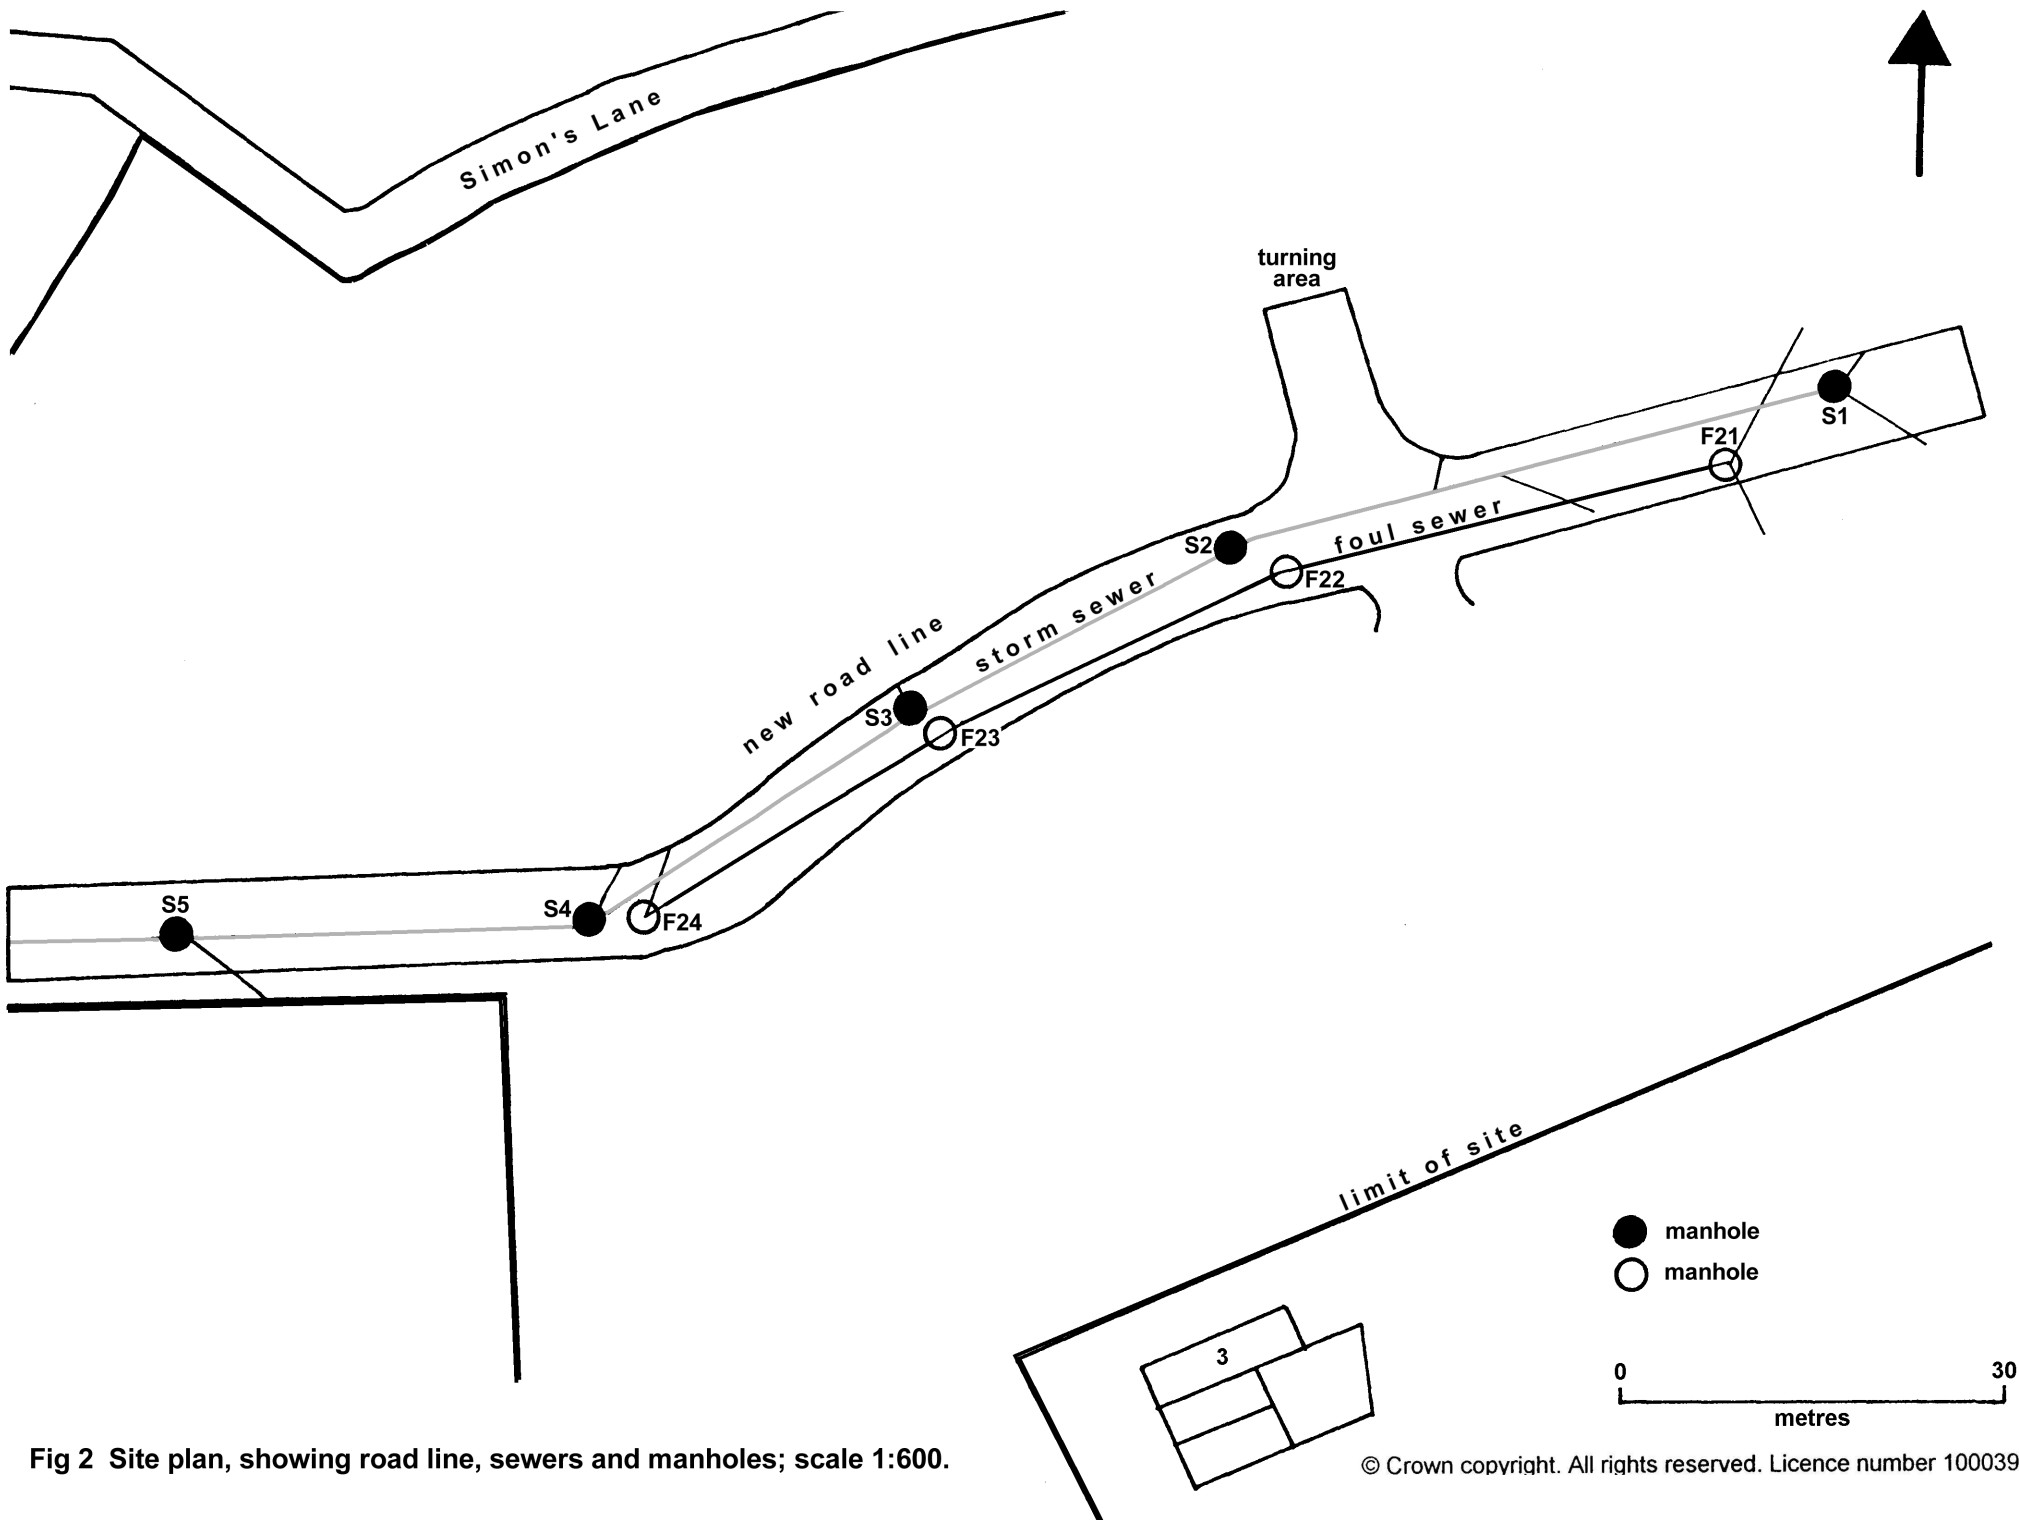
Site plan, showing road line, sewers and manholes; scale 1:600.
